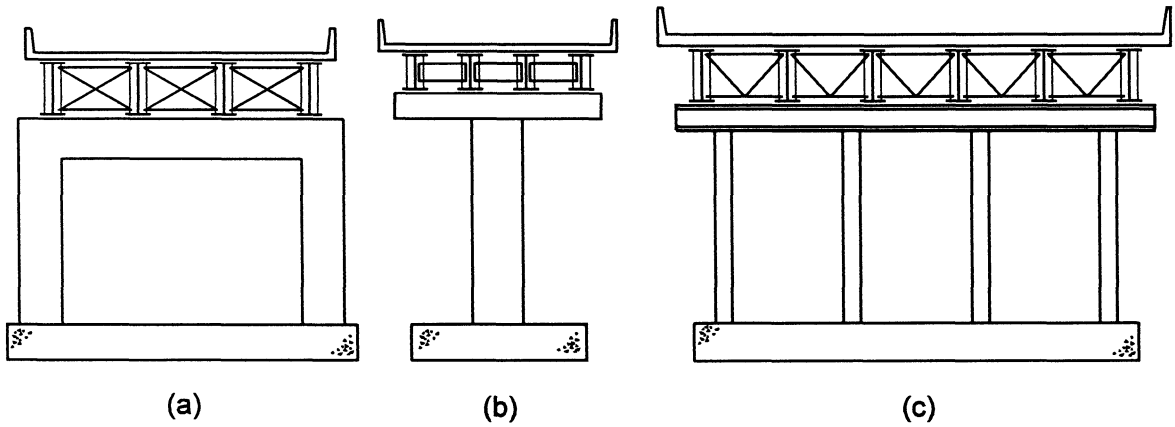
Several typical steel sub- and superstructure configurations
